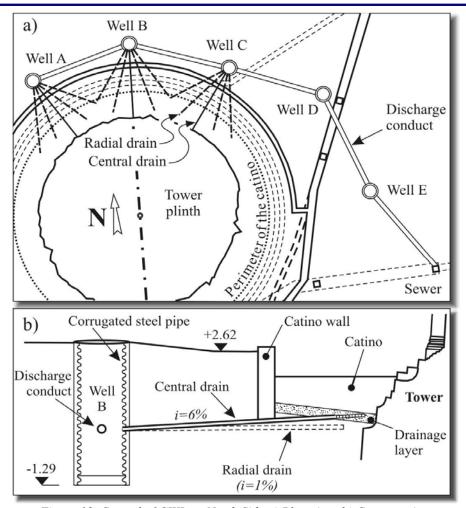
Control of GWL on North Side a) Plan view, b) Cross-section.
